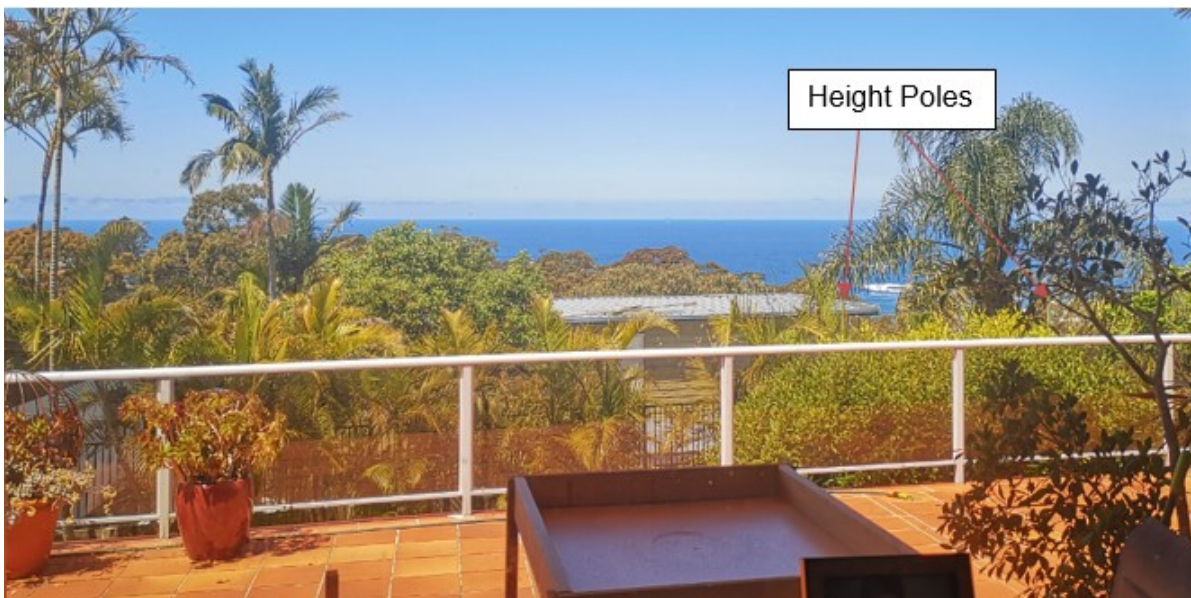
Existing views from 175 Plateau Road to the south-east (Kitchen - Standing).
